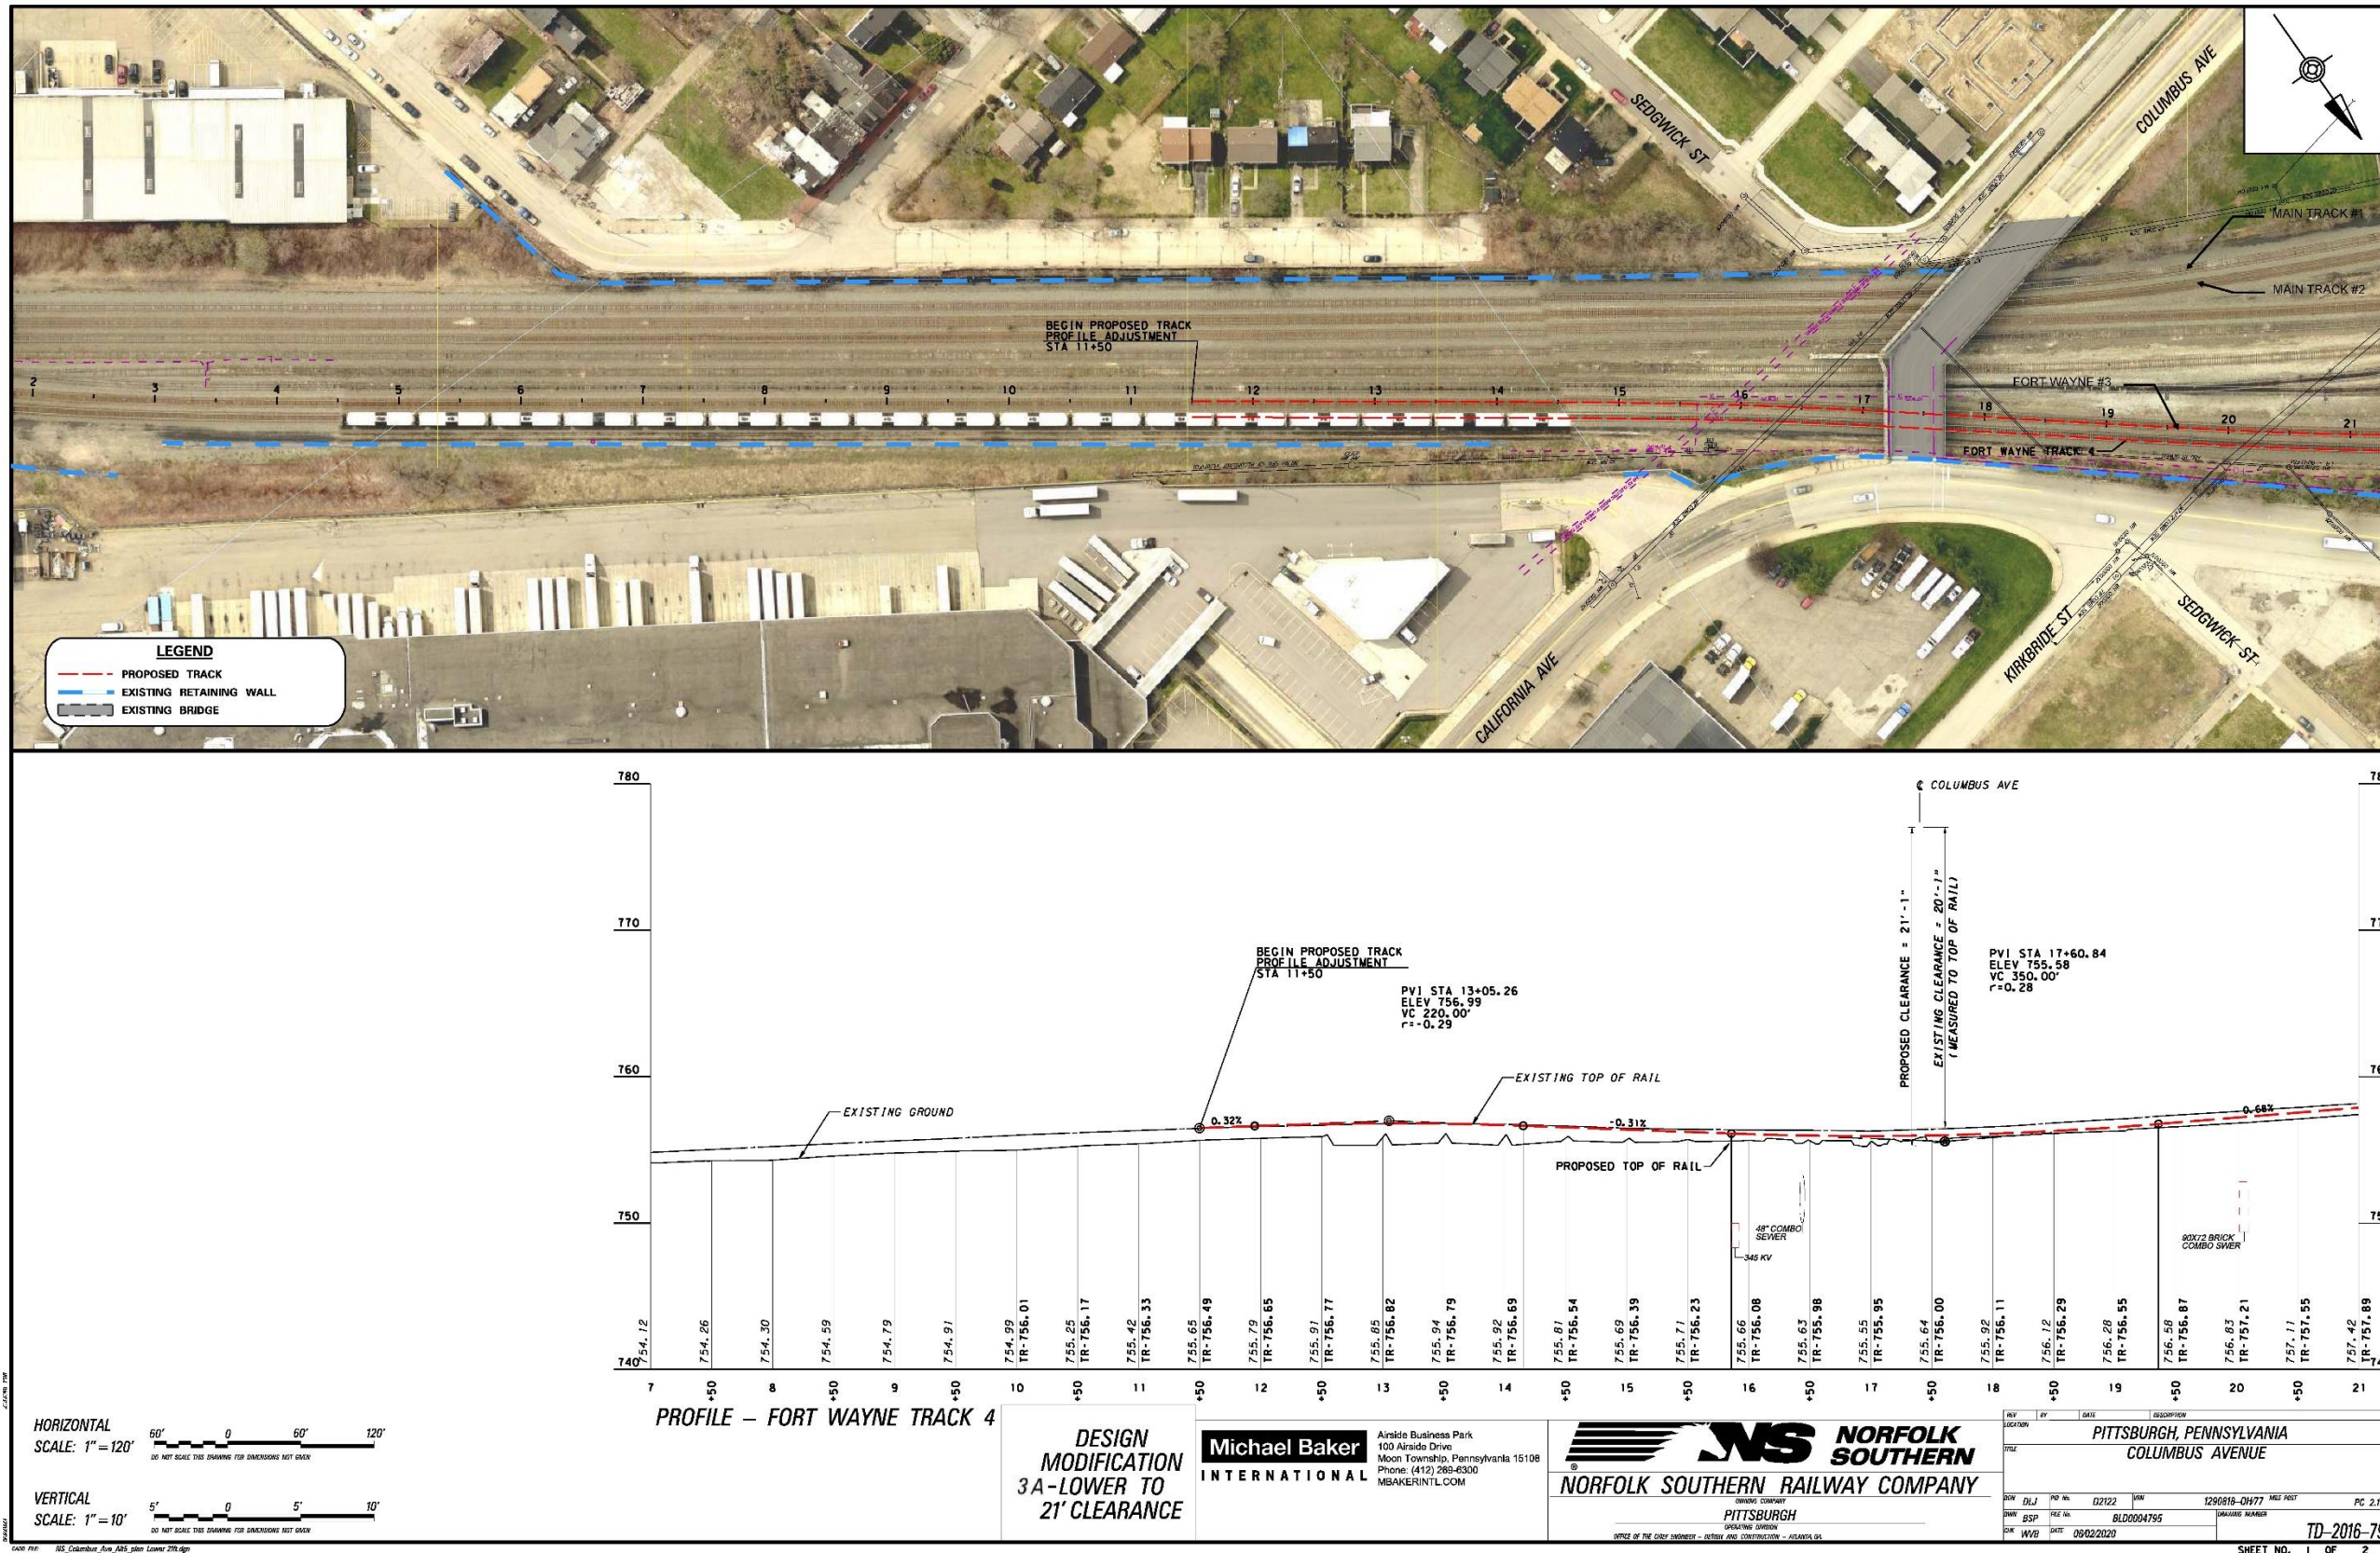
Plan and profile views of Alternative 3A showing area north of the bridge.
